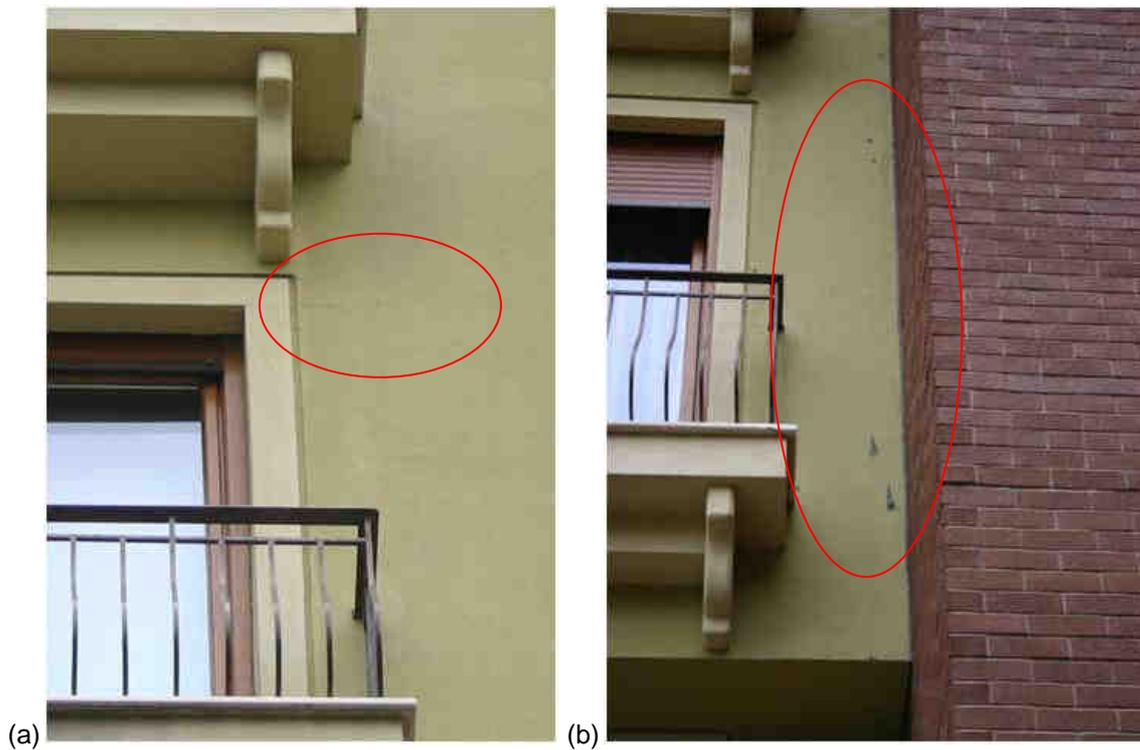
Examples from BS-F: (a) isolated crack at window corner, (b) delamination problems that have been occurred due to the impact of falling tiles
